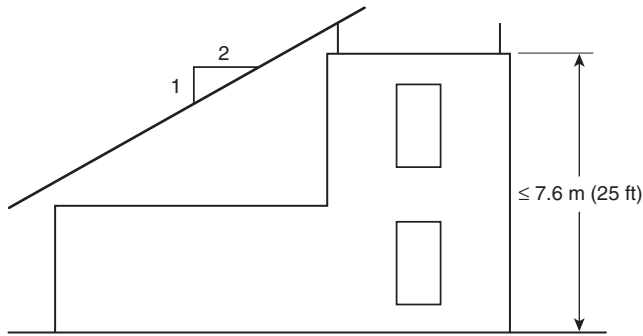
(a) Lower Roof Protection for Flat-Roof Buildings 7.6 m (25 ft) or Less in Height.
